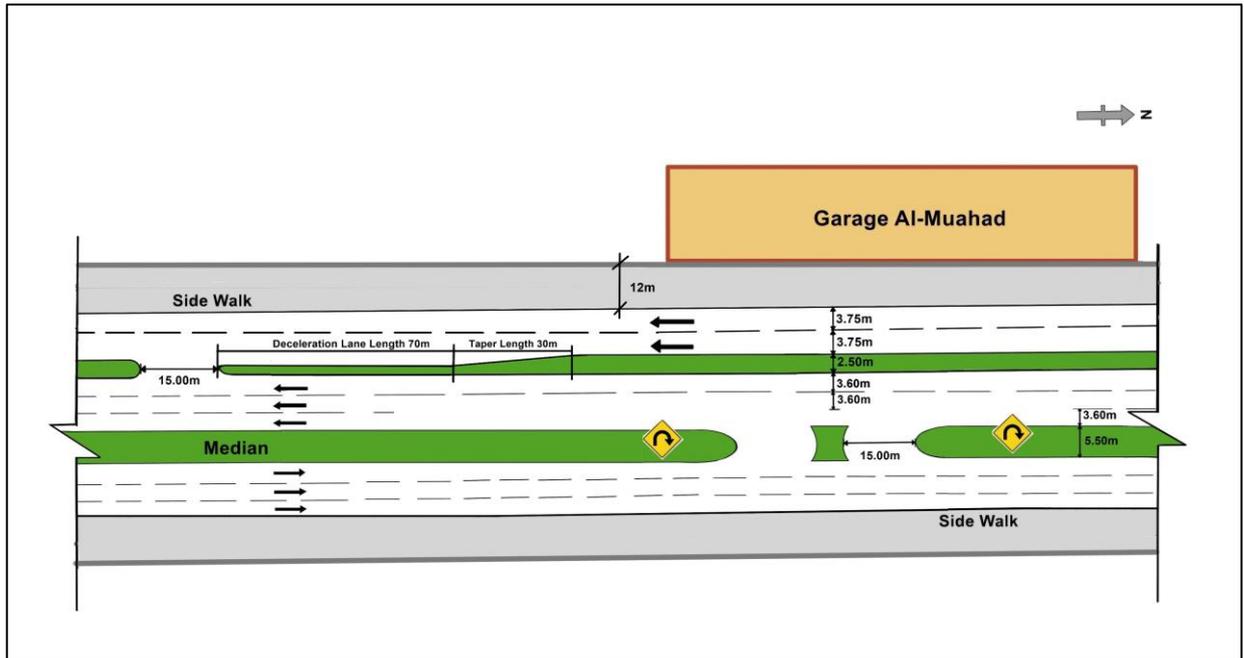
Improvement No.2 of Street 60 U-Turn.
